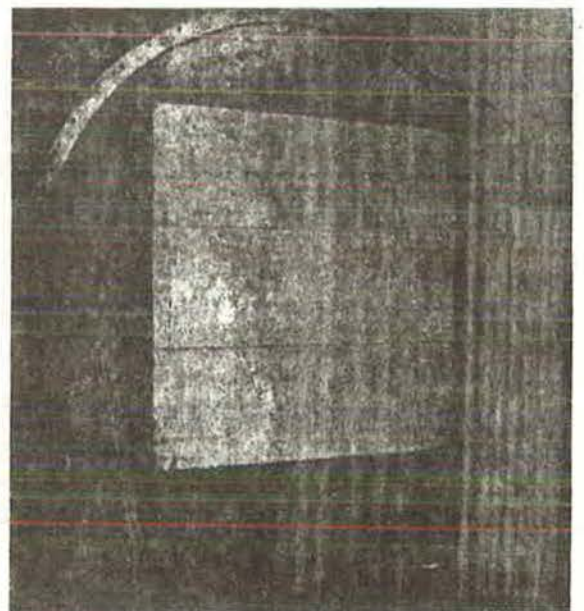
Concrete Specimen Installed in Diaphragm Plate and Dolly Used to Support Plates
